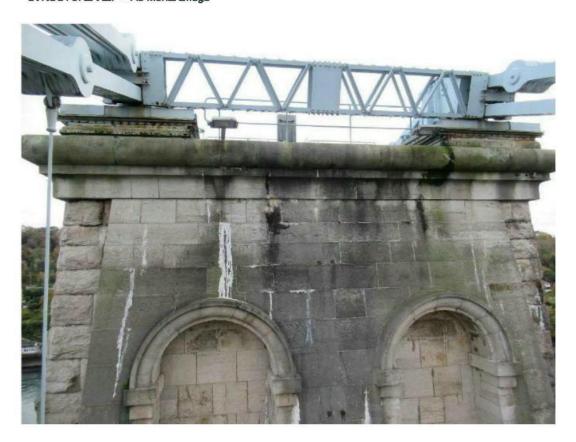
Primary deck element – small areas of surface corrosion to chain saddles, roller bearing baths and bracing on the north tower. Several areas of water-staining and efflorescence to the north face of the north pier.
